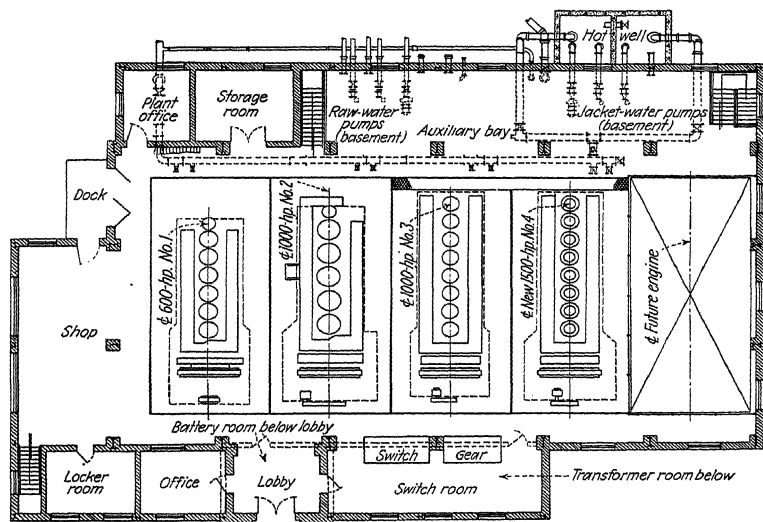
Floor plan of power plant shown in Fig. 35.
